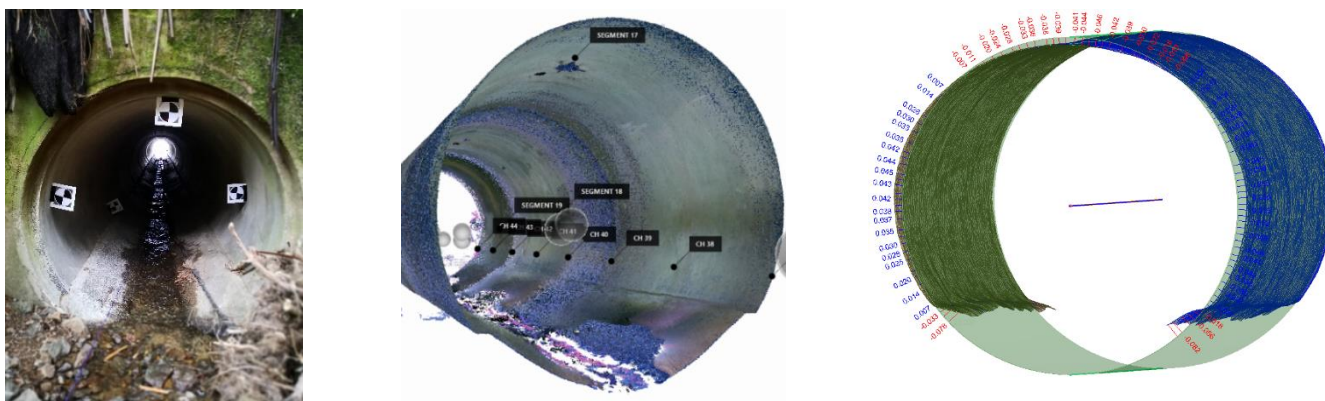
The SH35 culvert and typical Pipe-i scan outputs.
